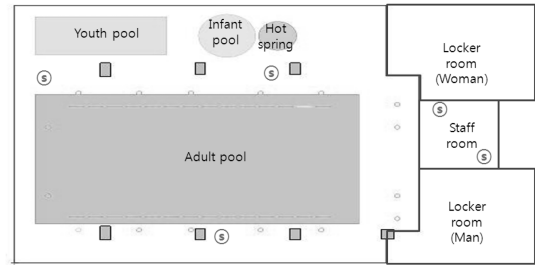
Floor sectional view of indoor swimming pool showing sampling site (S).
